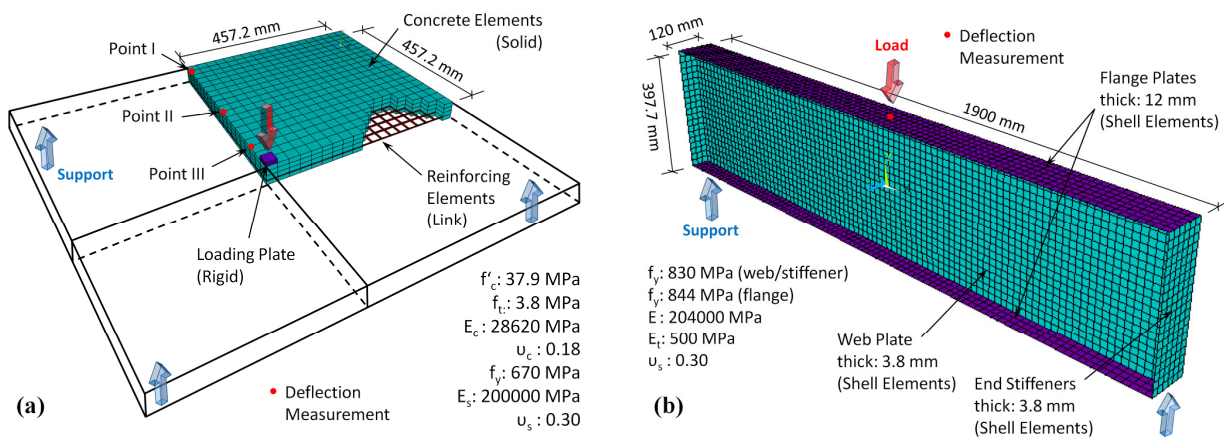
Intact element-level FE model development (a) concrete slab, (b) plate girder
